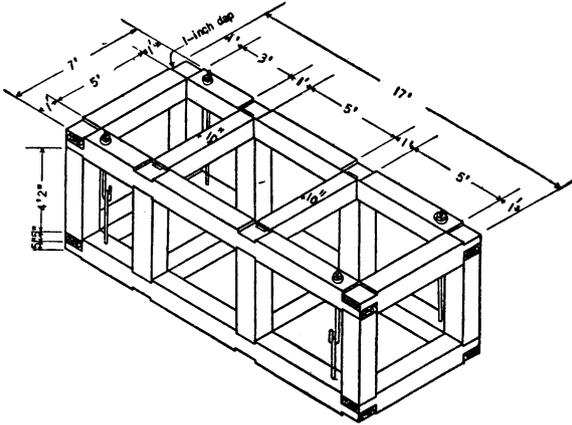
Standard shaft set, Black Rock mine, Butte & Superior Mining Co.
